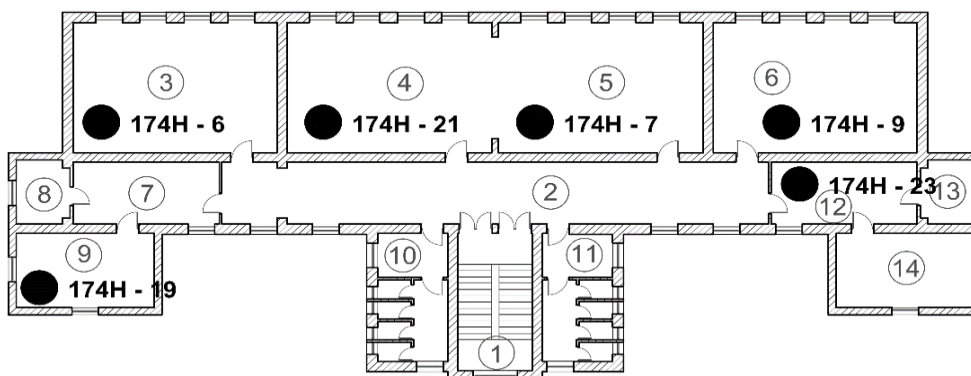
Plan of the first floor; 1 – stairs, 2 – corridor, 3 and 6 – classrooms, 4 and 5 – amphitheatre, 7 and 9 – office, 8 – pantry, 10 and 11 – toilets, 12 – reading room, and 13 and 14 – library
